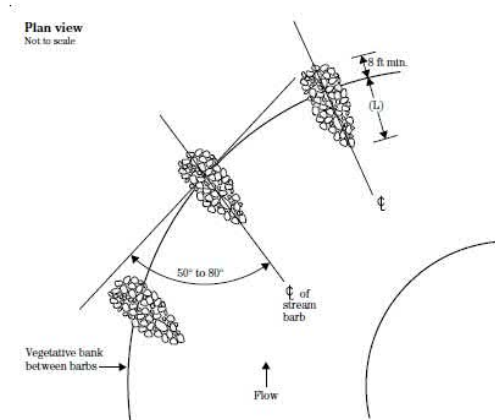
Plan view of a stream barb installation (USDA, 1996).
